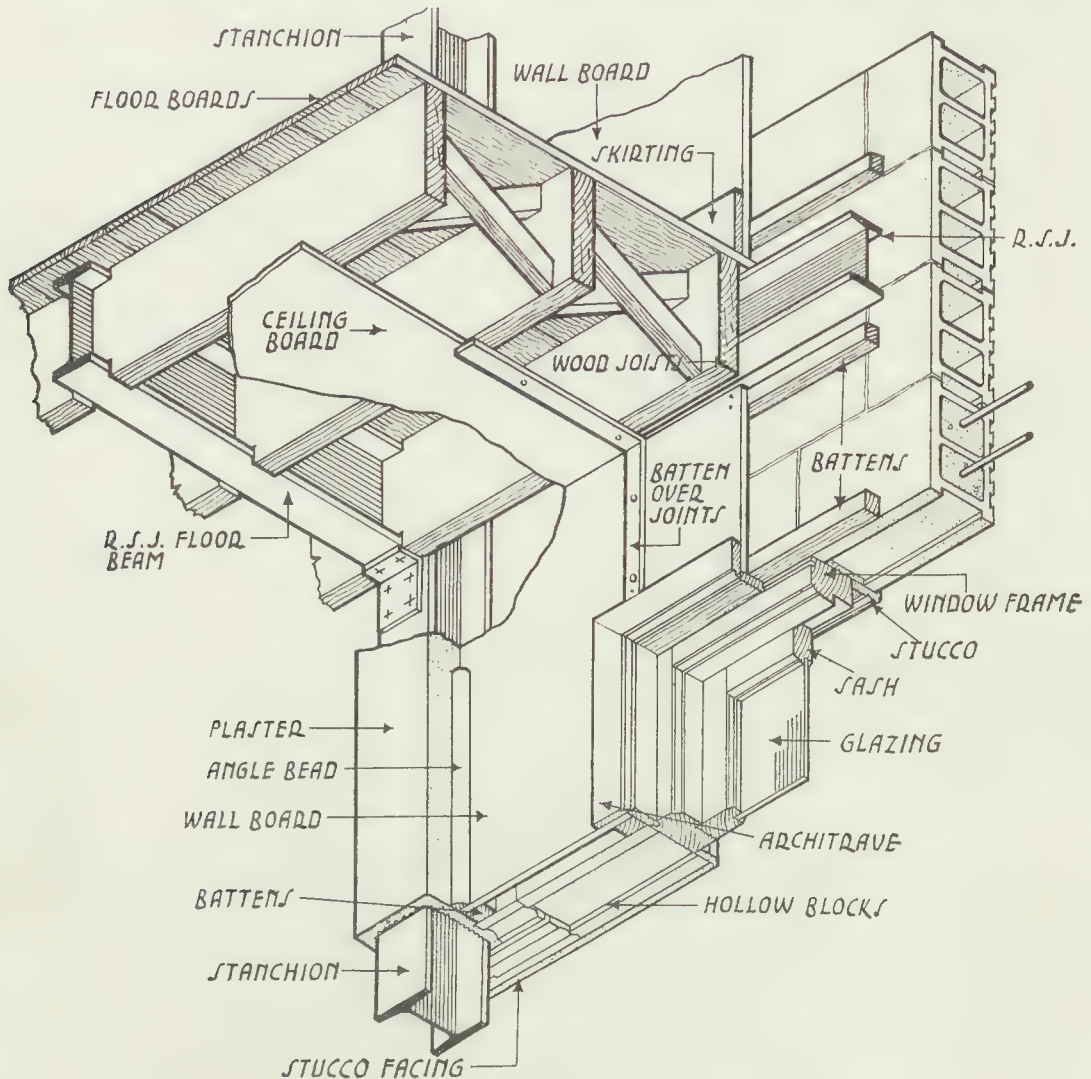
STEEL AND TIMBER UPPER FLOOR CONSTRUCTION SHOWING HERRING-BONE STRUTTING
